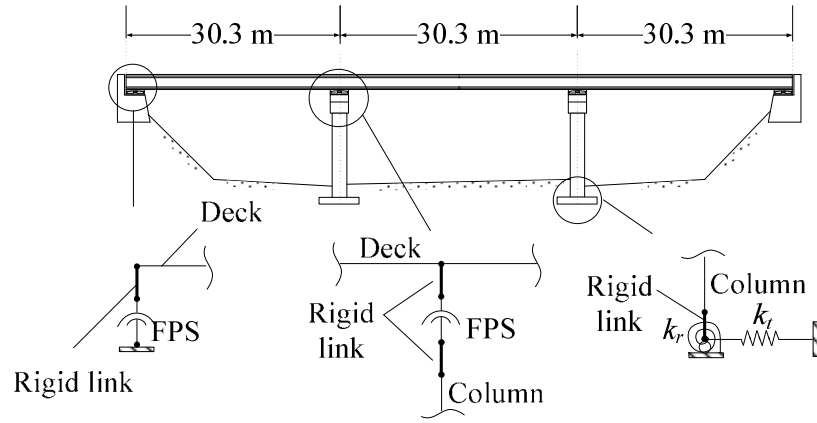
Multi-span continuous (MSC) steel girder bridge general elevation and modeling details.
